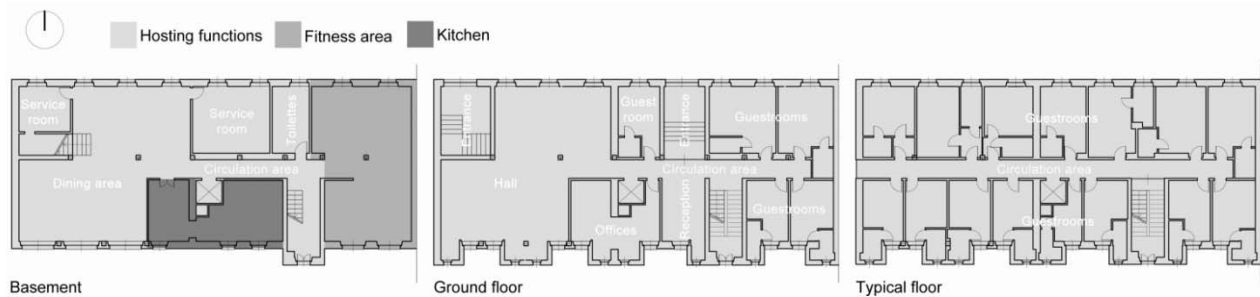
Italian existing RH internal layout for basement, ground floor and typical floor.
